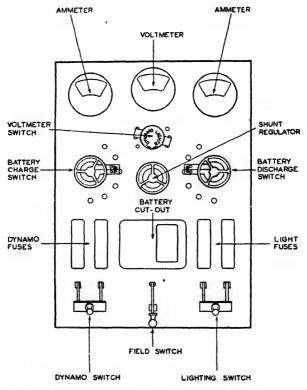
Layout of Typical Battery-charging Switchboard.
